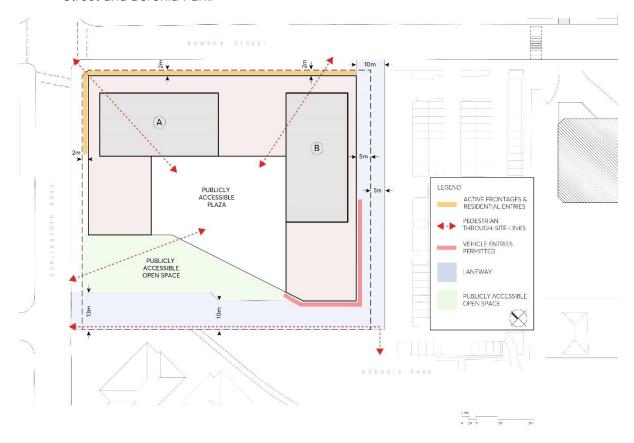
Indicative ground floor layout
